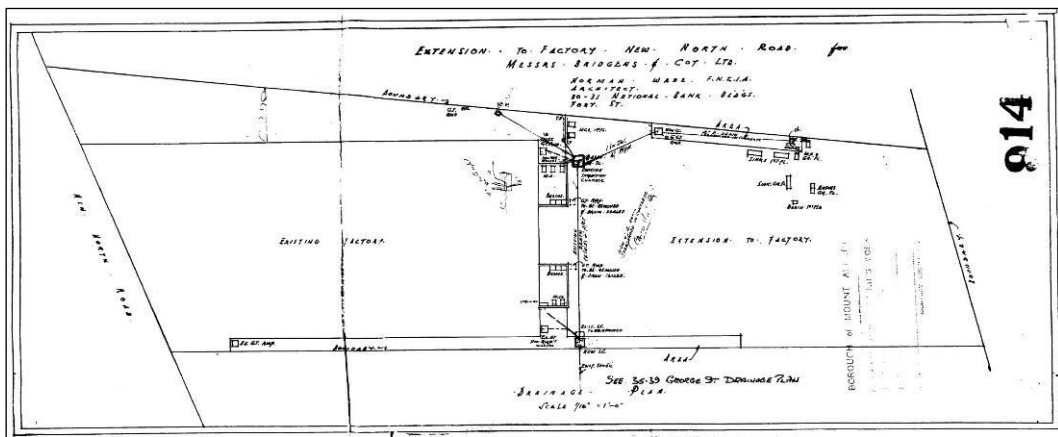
1929 Drawings for 'Extensions to Factory New North Road for Messrs Bridgens and Coy Ltd' - by Norman Wade, Architect: Drainage plan. The extension suffered major fire damage in 1998. It was redeveloped by Parker Brothers Ltd. The new building was then subdivided from the original factory building in 2000 – It is now therefore independent of the subject site. Auckland Council Filenet. Accessed October 2016. Full image. Close-up extract below.
